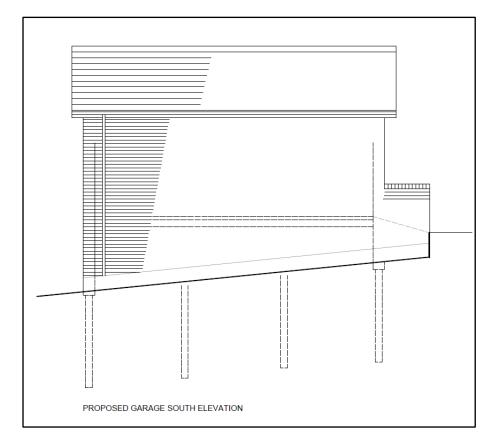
The garage has also been designed to sit on pile foundations to limit disturbance to below-ground portions of adjacent trees.
